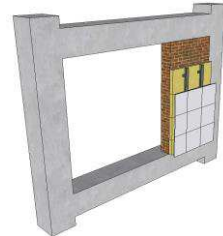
Ventilated façade: connection detail and assembly of the façade (source: www.walkingalmaty.com).
